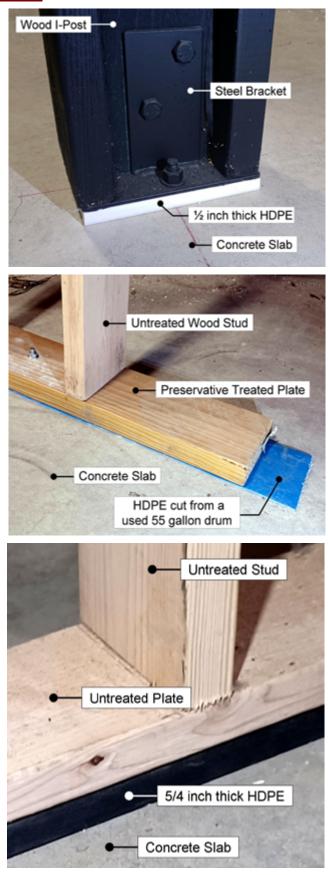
ISOLATING WOOD COMPONENTS FROM A CONCRETE FLOOR WITH HDPE COMPONENTS TO LIMIT WOOD DECAY IN A FOOD PROCESSING FACILITY.
